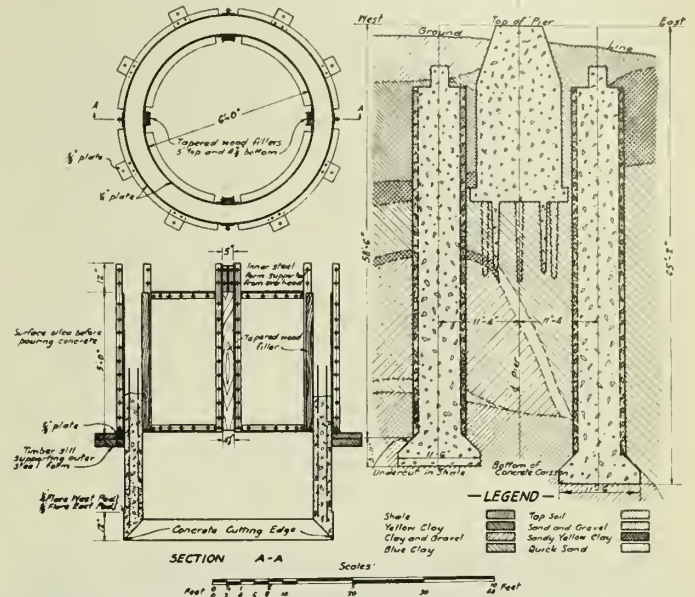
Steel Form for Concrete Caissons and New and Old Foundation for Pier 59 South.
